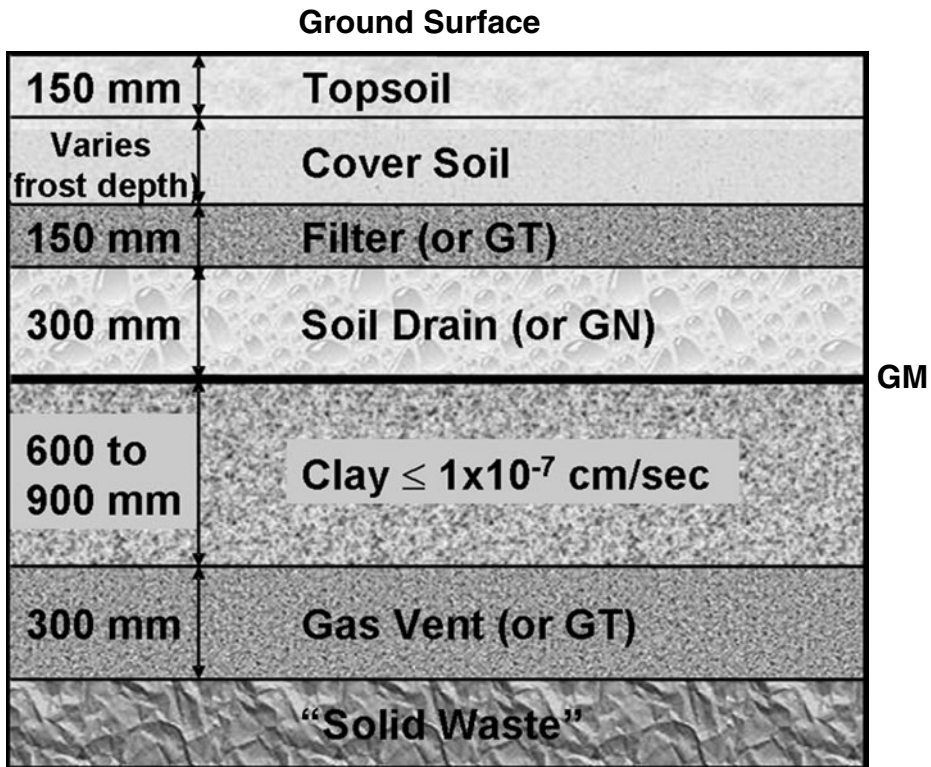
Typical Cover System Recommended by the U.S. EPA and U.S. Army Corps of Engineers for Landfills with Liner Systems as Shown in Figure 1-2.
